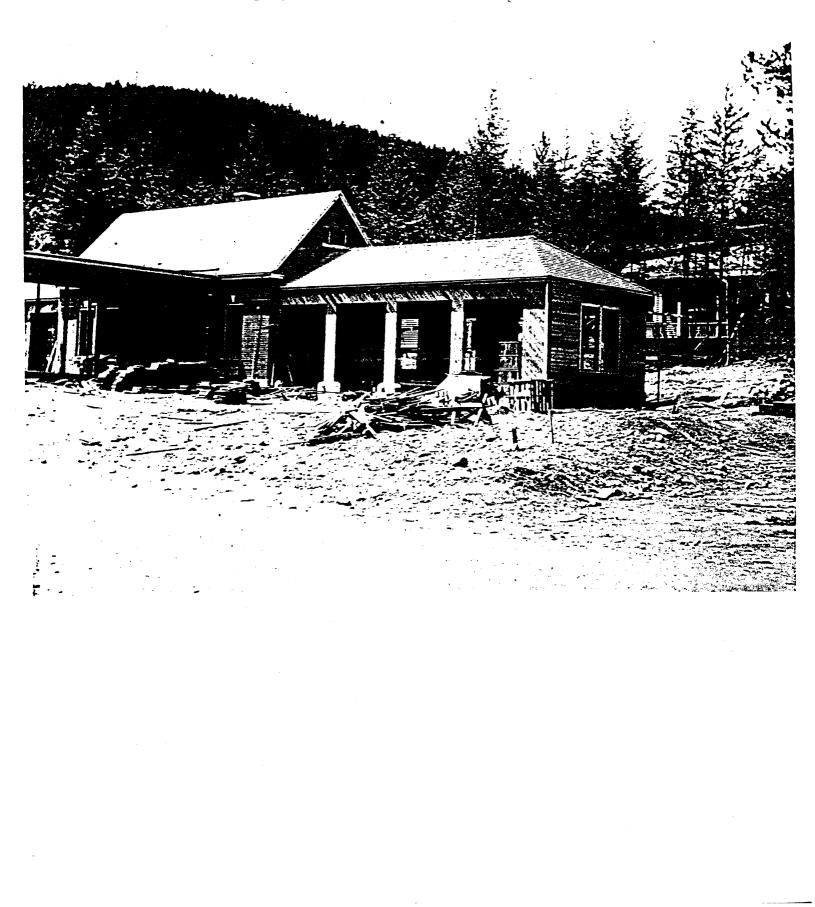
Historic photograph, construction of the Metaline Falls Inspection Station, view from the east of the canopy and south garage wing, 10/1/1932.
